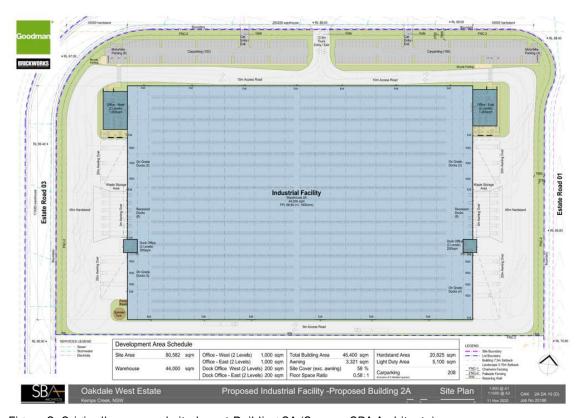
Originally proposed site layout Building 2A (Source: SBA Architects)
